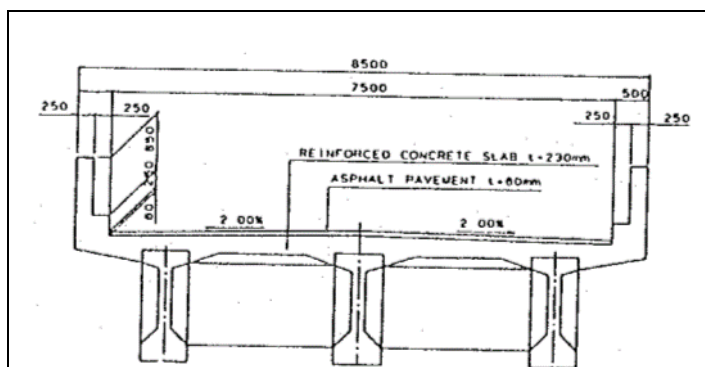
General Cross Section Drawing of Bridges in Section I (Ch.0+000 – 37+000)
